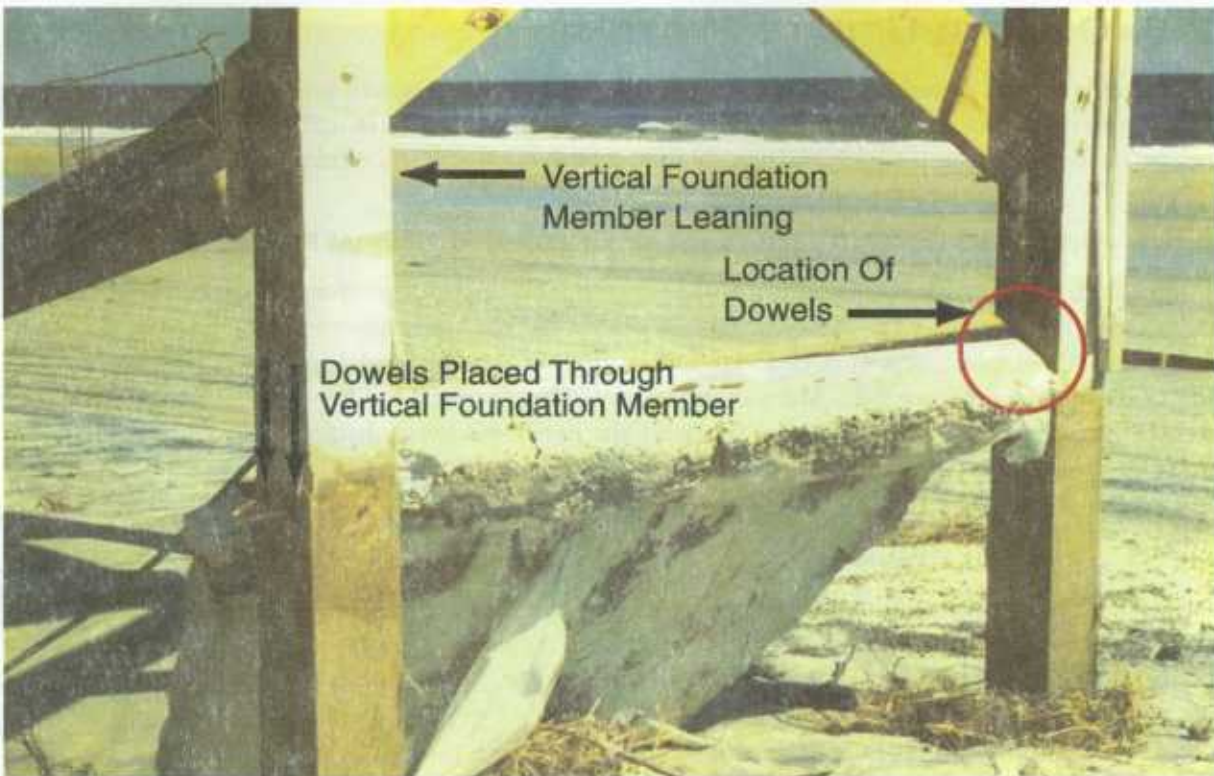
Use of steel dowels to tie slabs to vertical foundation members prevented the proper breakup of slab. A portion of the slab was left attached to the piling, resulting in large, unanticipated loads on foundation members. Note leaning vertical member, on right.
